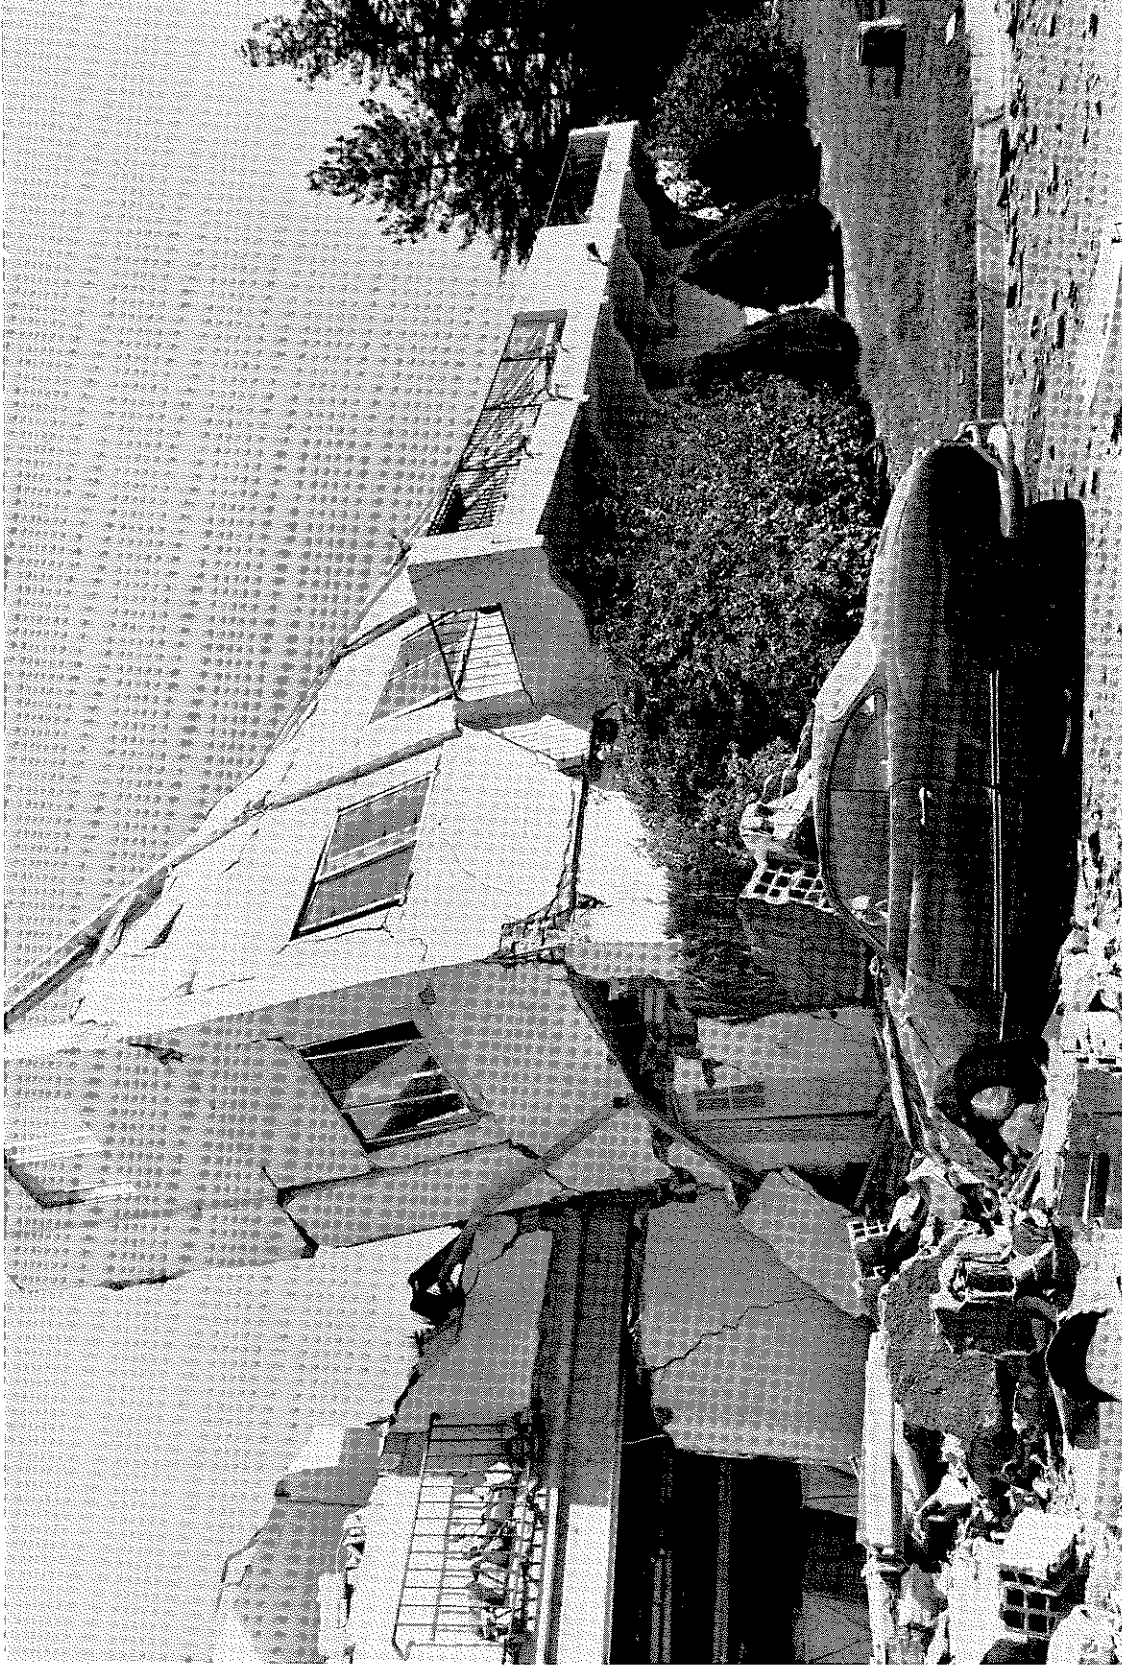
The collapsed Semi-Ambulent Building at the San Fernando Veterans Hospital. View is looking to the northeast shortly after the earthquake. L.A. Times photo.
